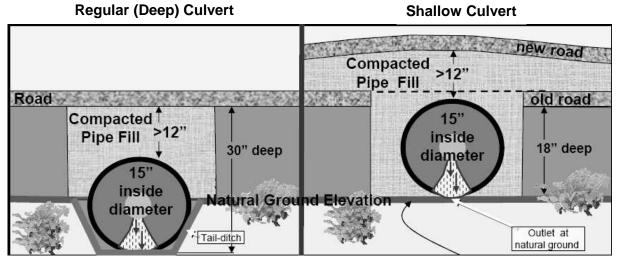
Side View, looking through culvert from outlet, comparing regular and shallow culvert placements.
